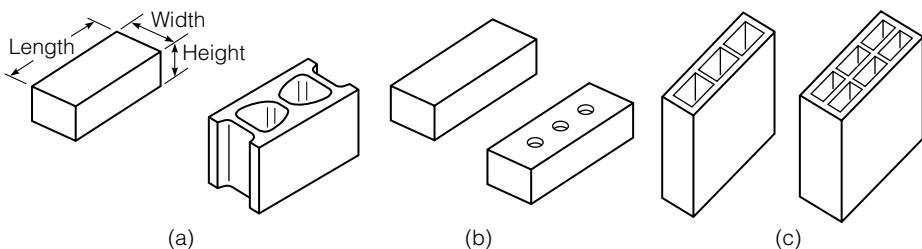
Examples of masonry units: (a) concrete masonry units, (b) clay bricks, and (c) structural clay tiles
